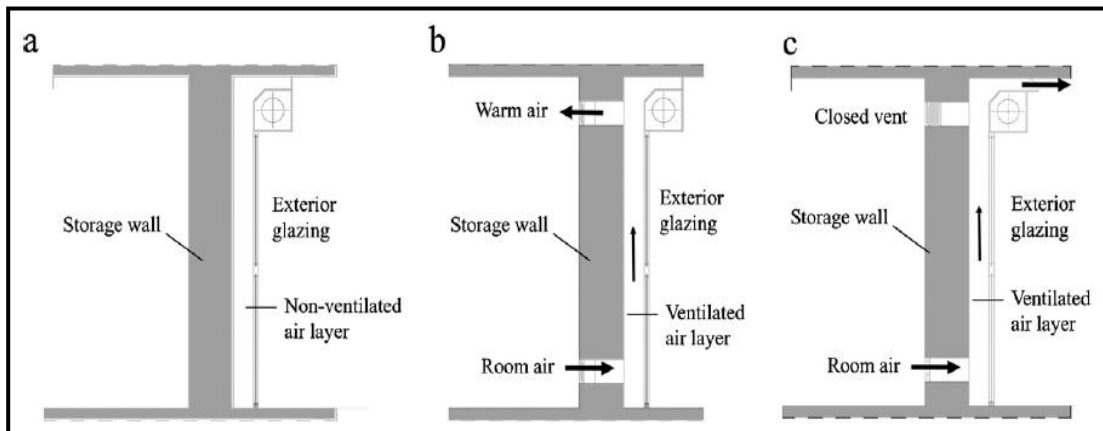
Trombe Wall Arrangement: a) Non-Ventilated; b) for Winter; c) for Summer (Stazi et al., 2012)
